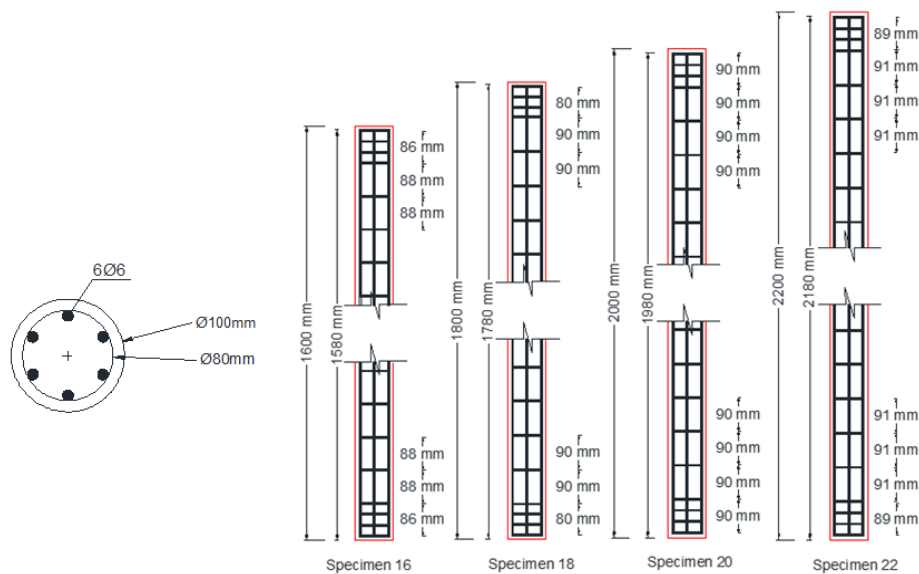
Concrete dimension and reinforcement details of the test specimens.
